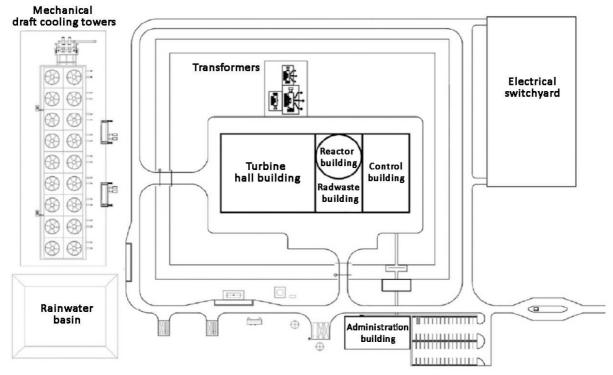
Example location of power plant buildings (source: GE-Hitachi)
